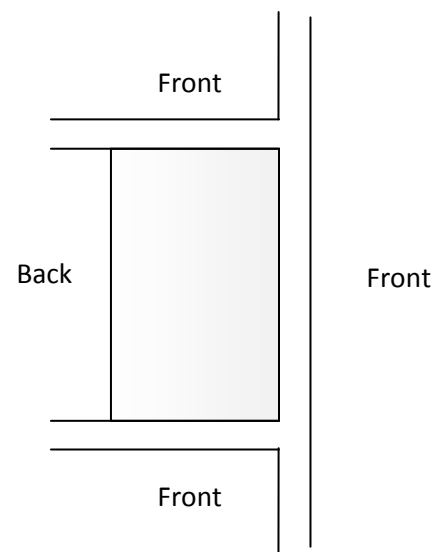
The Proposed Site Orientation for Set Back (Source: Author)
